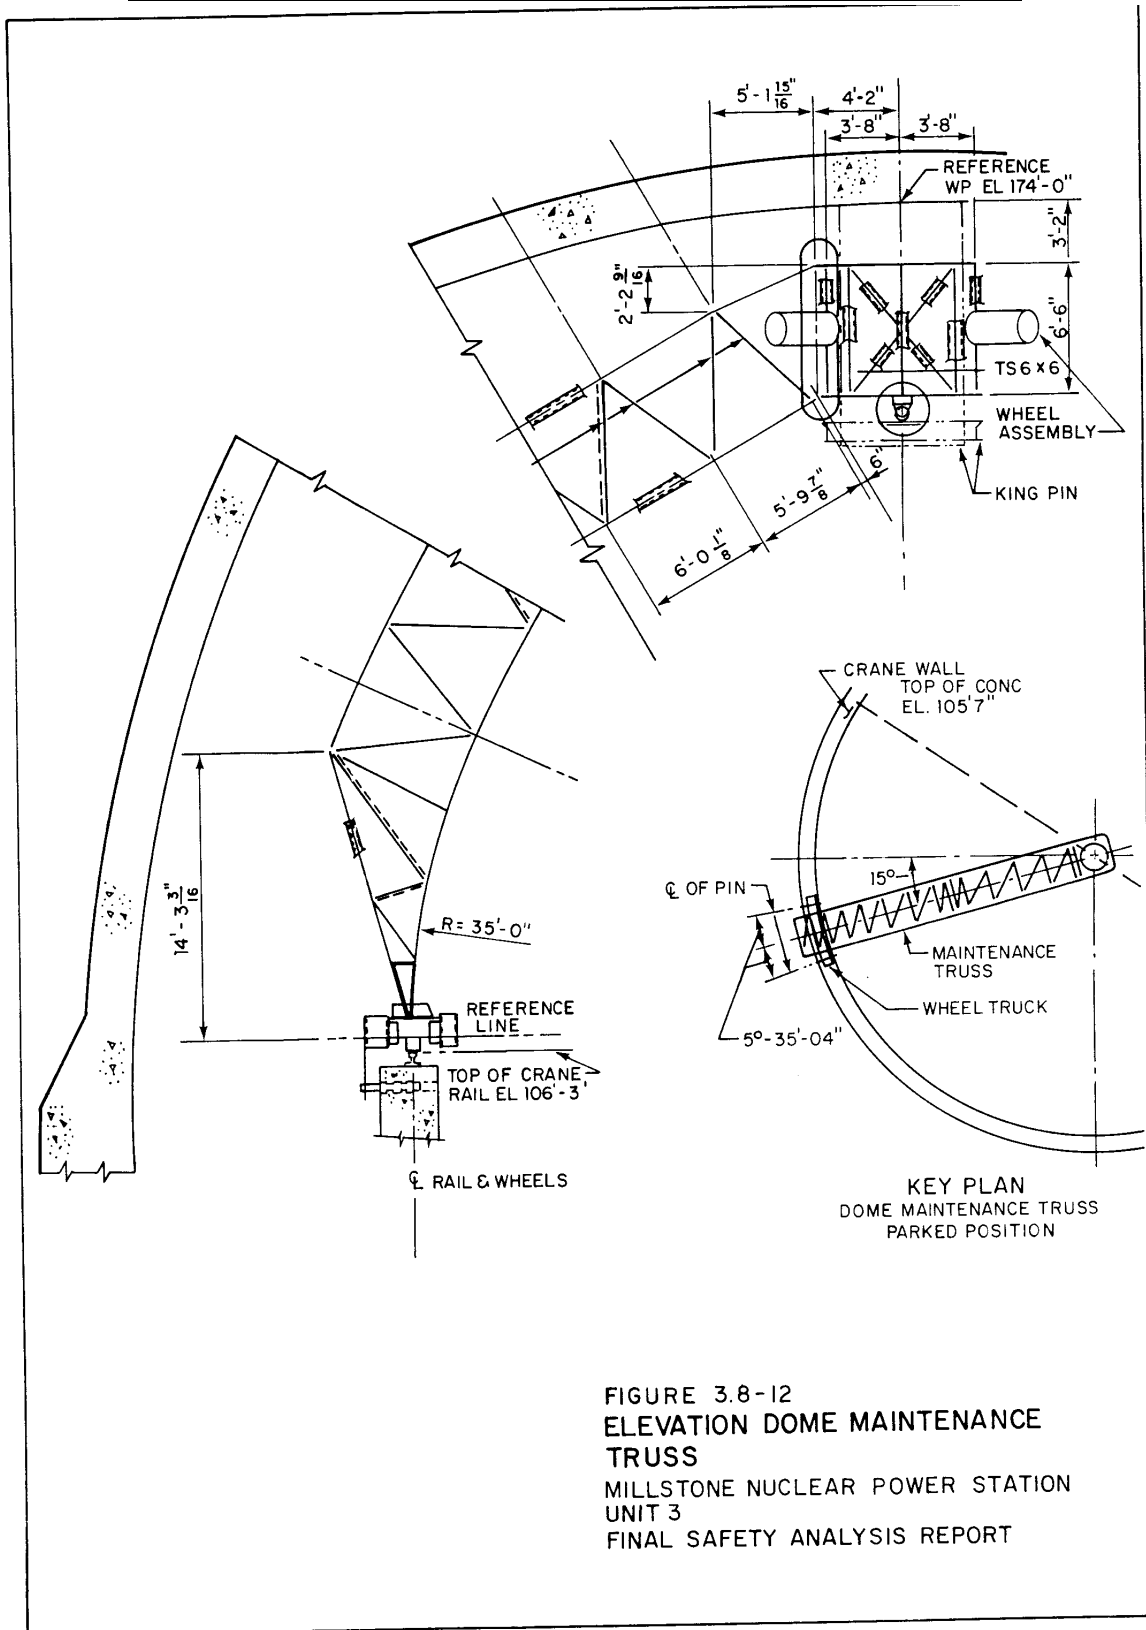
ELEVATION DOME MAINTENANCE TRUSS
